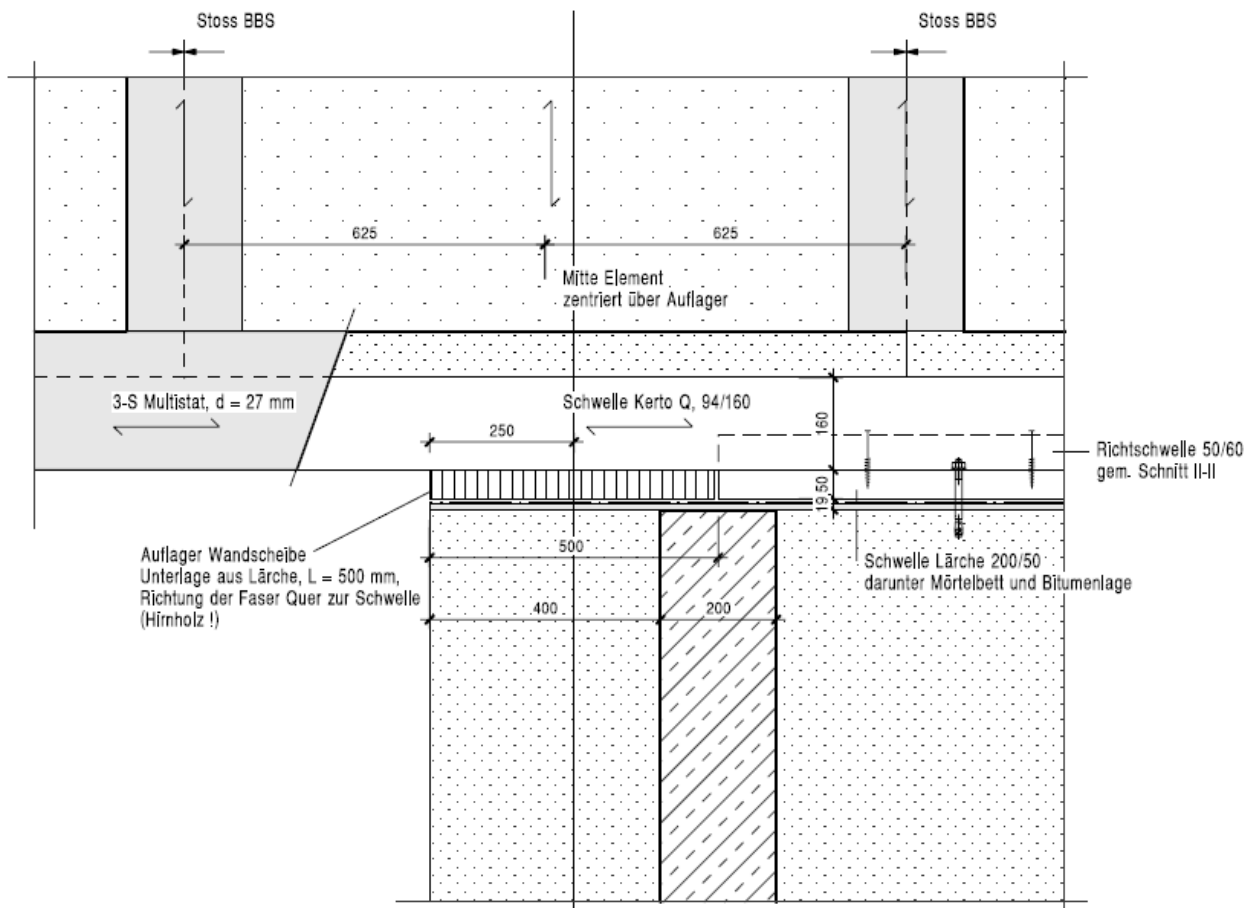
Detail of foundation of the Wall on the concrete wall (Merz, Kaufmann und Partner GmbH)
